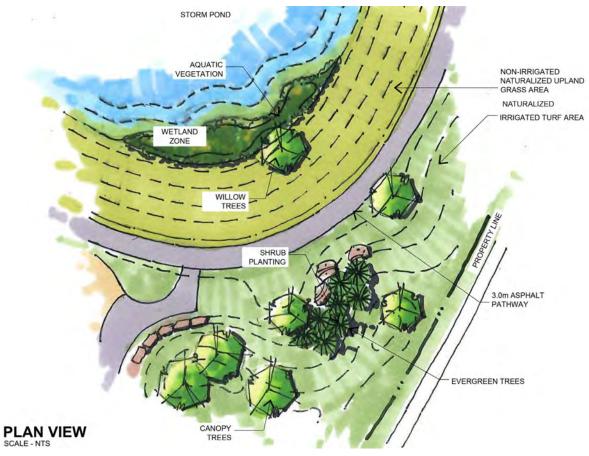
Sample Cross-Section /Plan with Recessed Pathway
